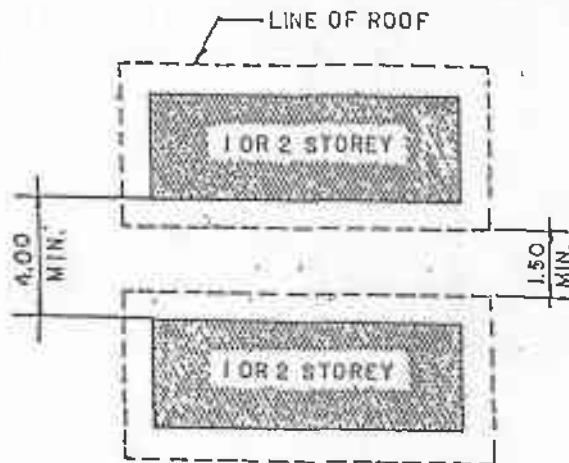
DISTANCE BETWEEN 2-STOREY BUILDINGS
